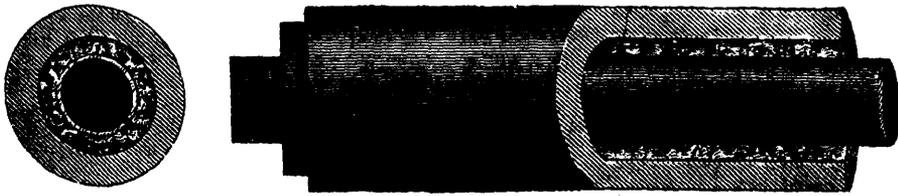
Use of Mineral Wool Inside of Wooden Collars. Plan Pursued by the New York Steam Company with its Underground Pipes.
